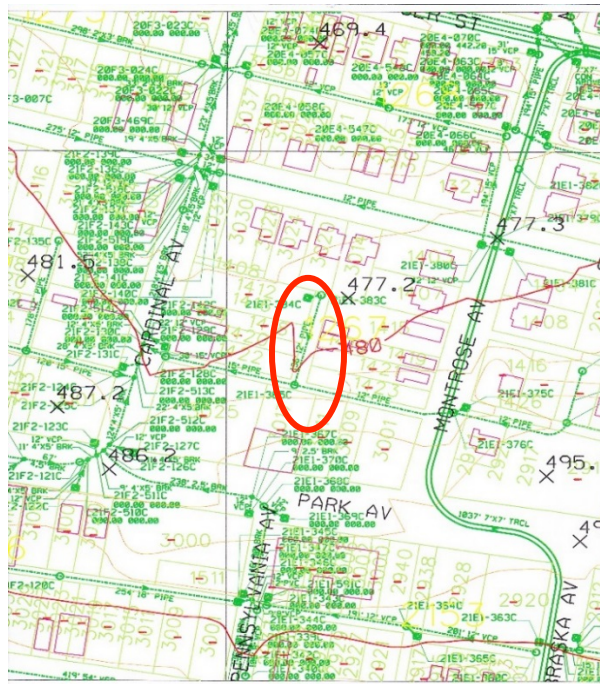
Asphalt Permeable Pavement at Cardinal Ave.
